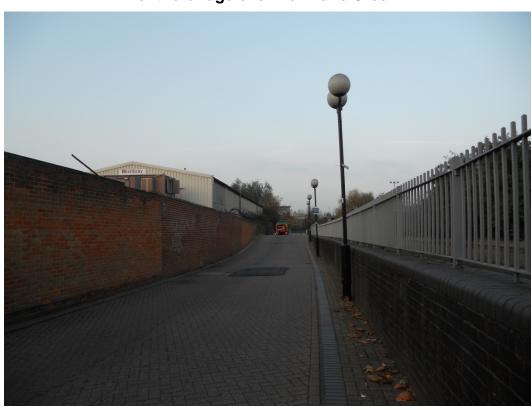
Cycle Route 20 along The Causeway looking north, south of the bridge over Bell Lane Creek
